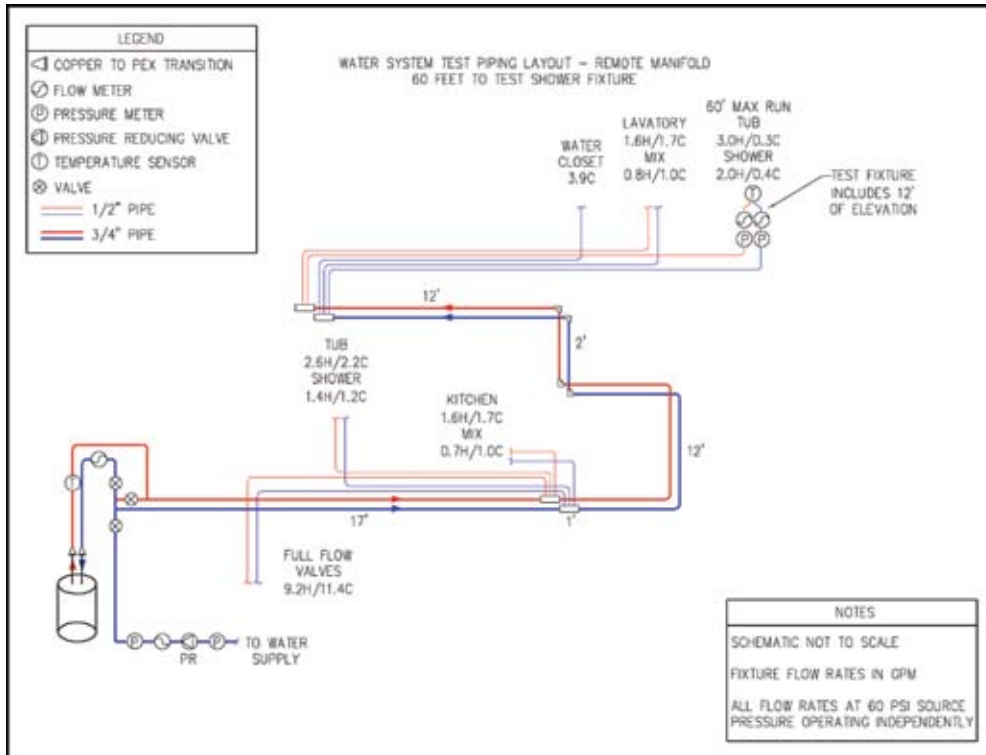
Water System Test Piping Layout – Remote Manifolds, 60' to TF
